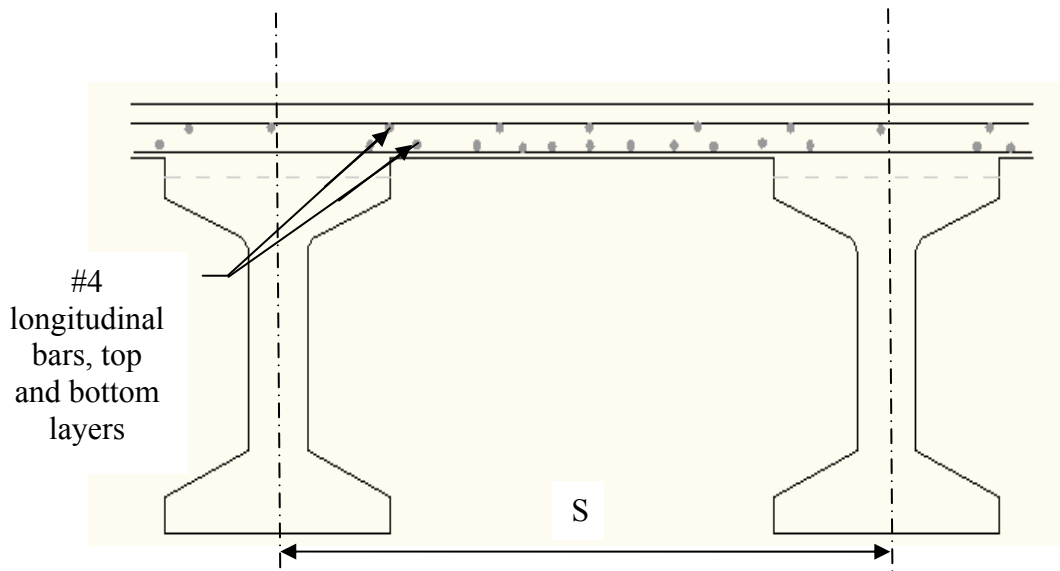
Section view of recommended continuous deck detail with #4 bar longitudinal reinforcement continuous over joint (modified from GDOT SR 46 Over Oconee R. plan)
